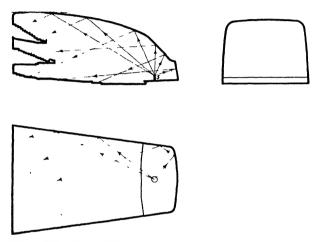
The Salle Pleyel in Paris, showing Splayed and Inclined Side Walls and Parabolic Ceiling. Length excluding Stage 164 feet; Width 68–102 feet; Mean Height about 64 feet.
